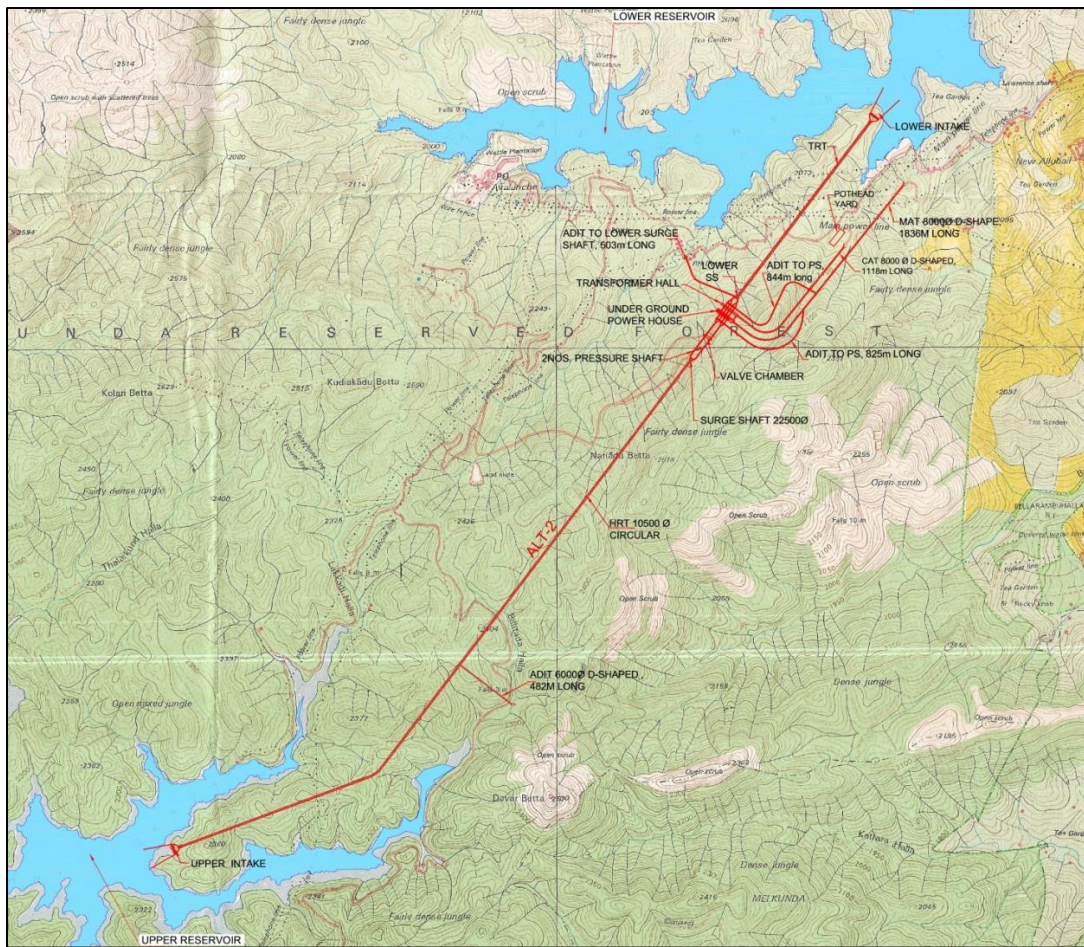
1 General layout plan of the Upper Bhavani PSP (1000 MW)
